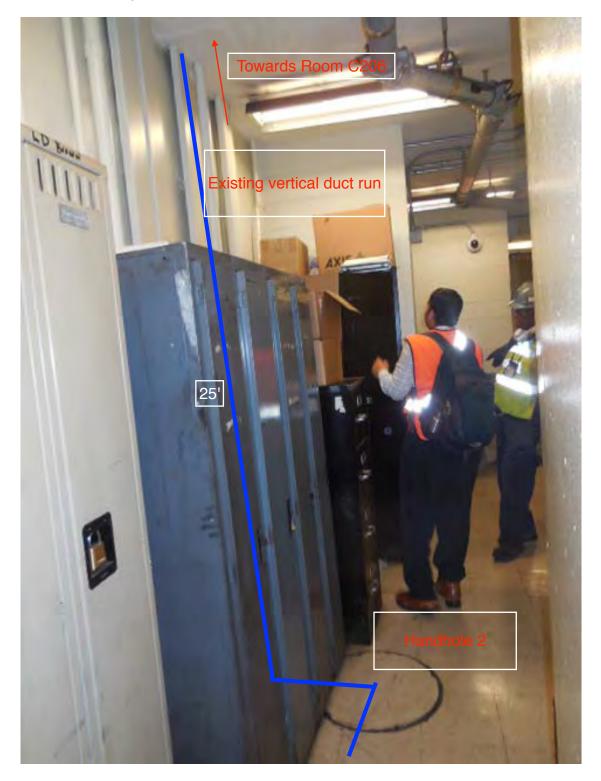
Proposed junction box and overhead conduit from duct stub-up in Cleaners Room.
